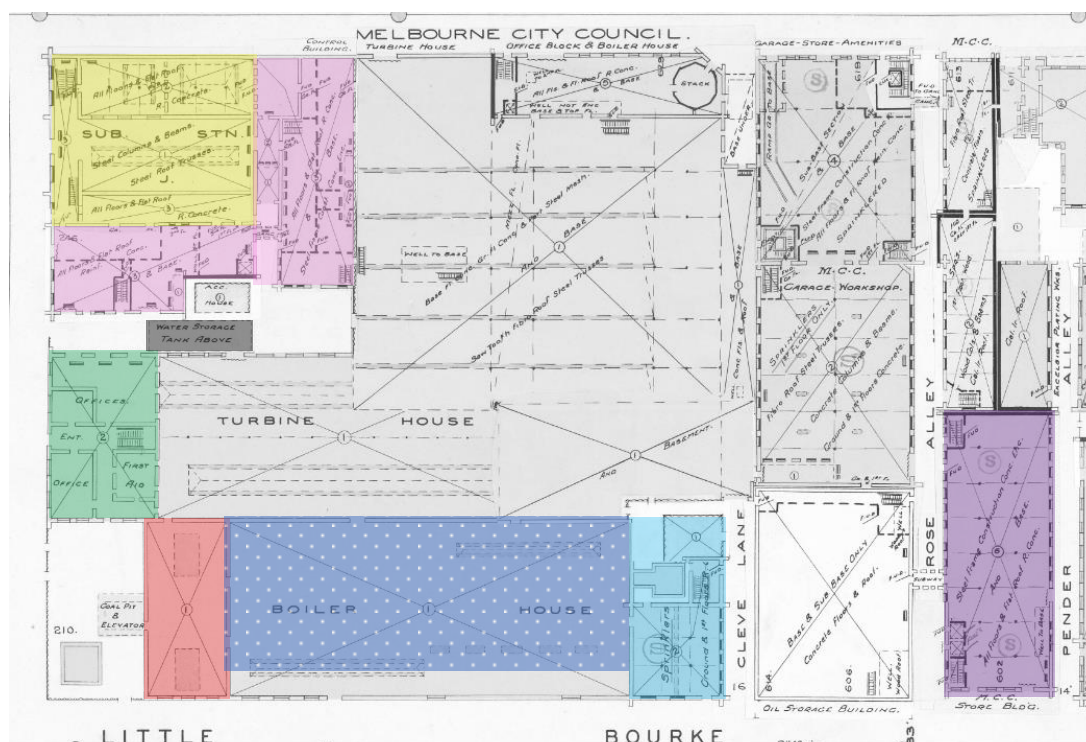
Showing the Melbourne City Spencer Street Power Station in the c1960s. The 602-606 Little Bourke Street building named 'MCC Store Bldg' (purple), the 1925 substation building (blue), the 1985 substation JA and service vehicle yard (dark blue hatching), the Economiser building (red), Offices (green), Substation J (yellow) and reinforced concrete additions to the south and east (pink), and overhead water tank (grey) can all be seen in relation to the other, now lost, buildings that comprised the electricity supply complex. (Source: Mahlstedt Map Section 1, no 22, 1948, with later amendments)
